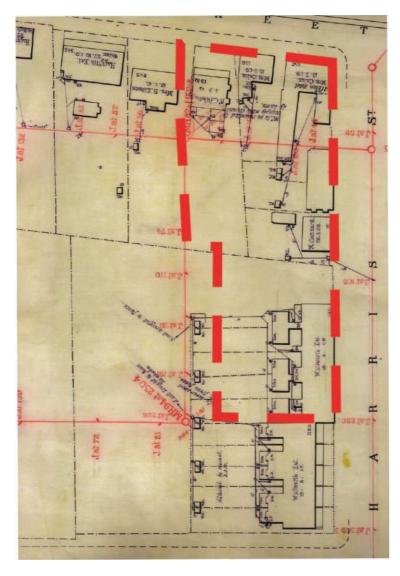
The Take Over Plan for the Parramatta sewerage scheme dated 21 December, 1910, showed all the buildings in precise detail, as well as identifying the owners. PTO 10, Sydney Water Plans Room.
